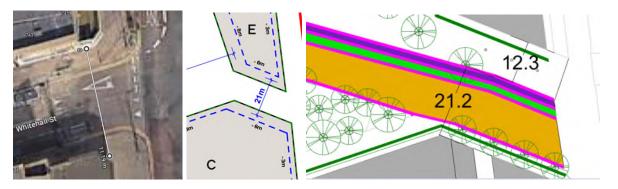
Existing width at Whitehall Street access (~11 m), Parameter plans minimum separation between plot E and C, current illustrative masterplan showing queue lanes within the 21 m width with an additional 12 m available.
